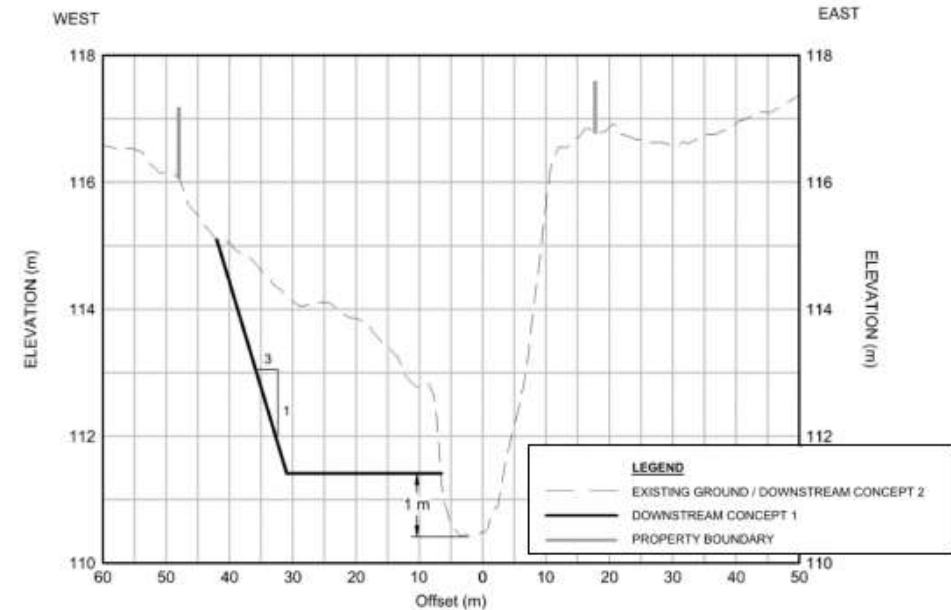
Cross-Section - Downstream Concept 1 and Downstream Concept 2
